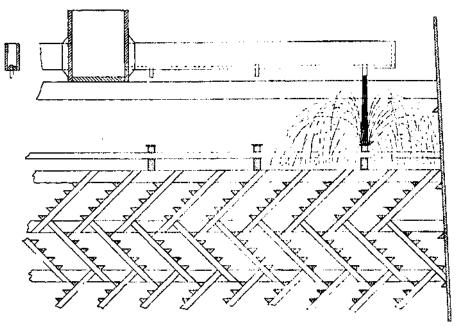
Arrangement of Splash-bars, &c.—-Premier Cooler and Engineering Company
